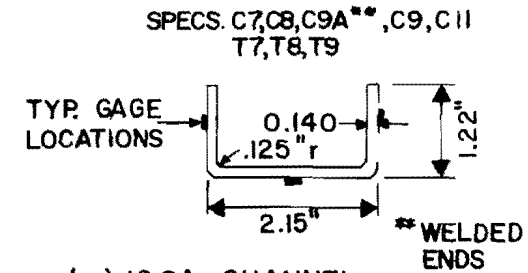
FULL SECTION SPECIMENS AND AVERAGE DIMENSIONS
